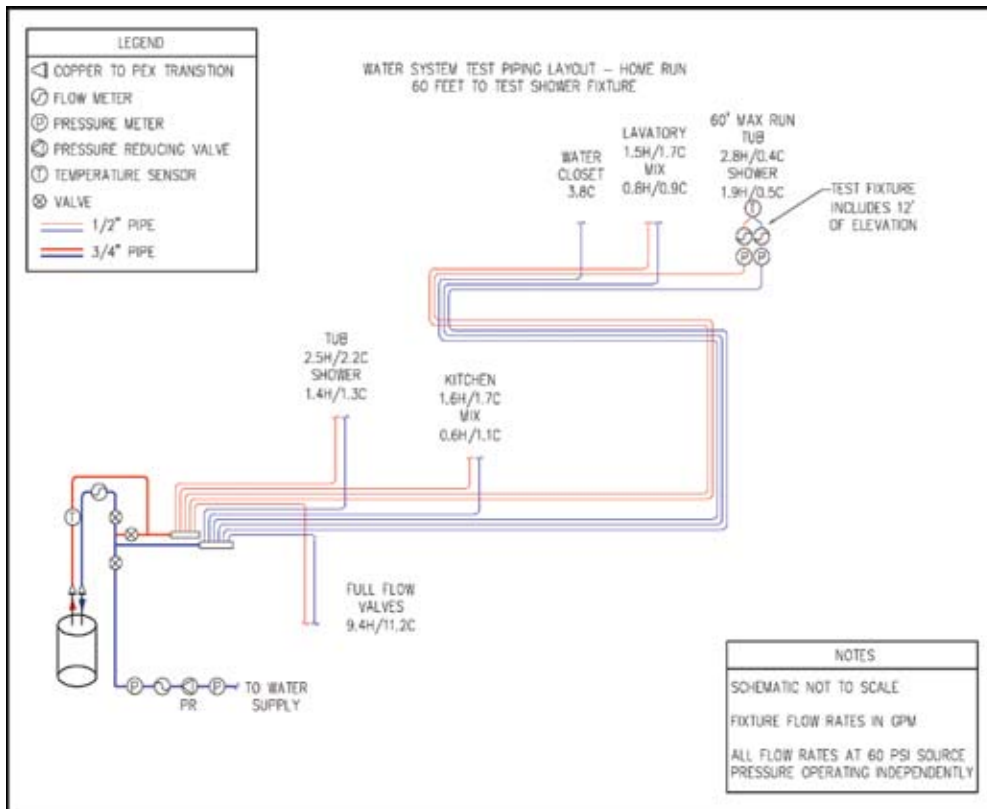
Water System Test Piping Layout – Home-Run, 60' to TF
